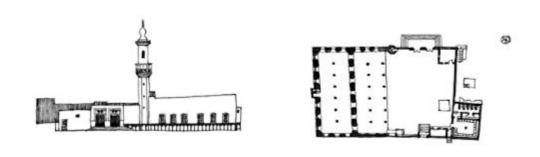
Sketches of the elevation and floor plan of Al Khalifa Mosque in Kuwait. Source: (Khattab, 2002).
